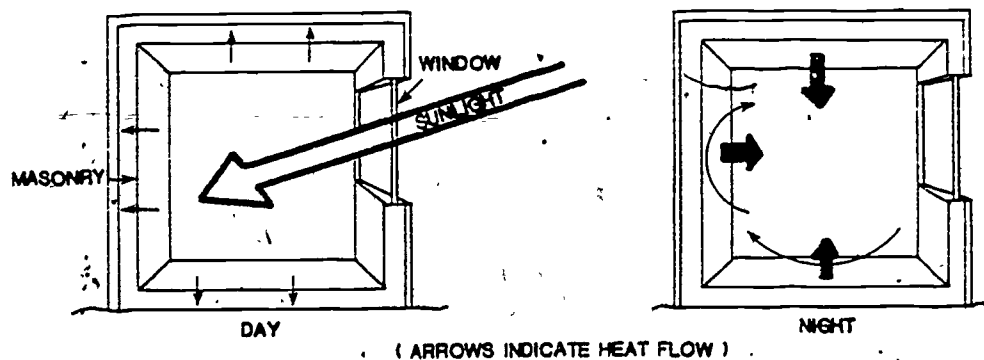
Masonry Thermal Storage Walls (Direct Gain).
